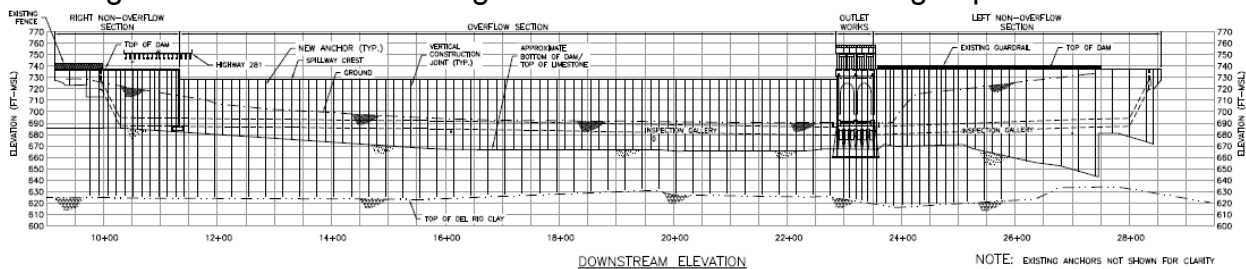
Downstream Elevation View of Olmos Dam with Proposed Anchors
